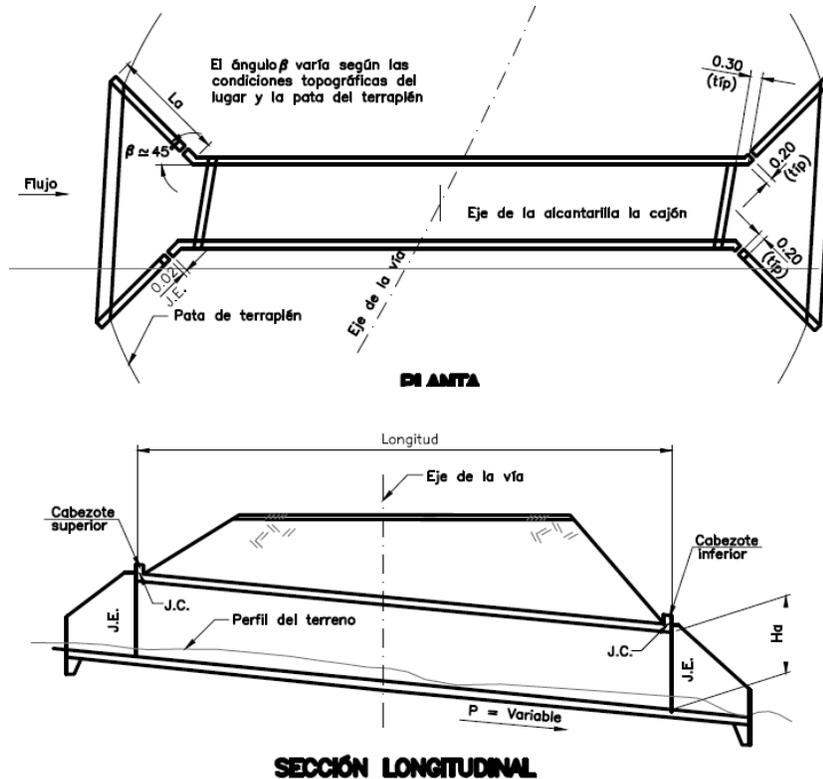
Typical section of box culvert Puerto Bahía Colombia de Urabá.
